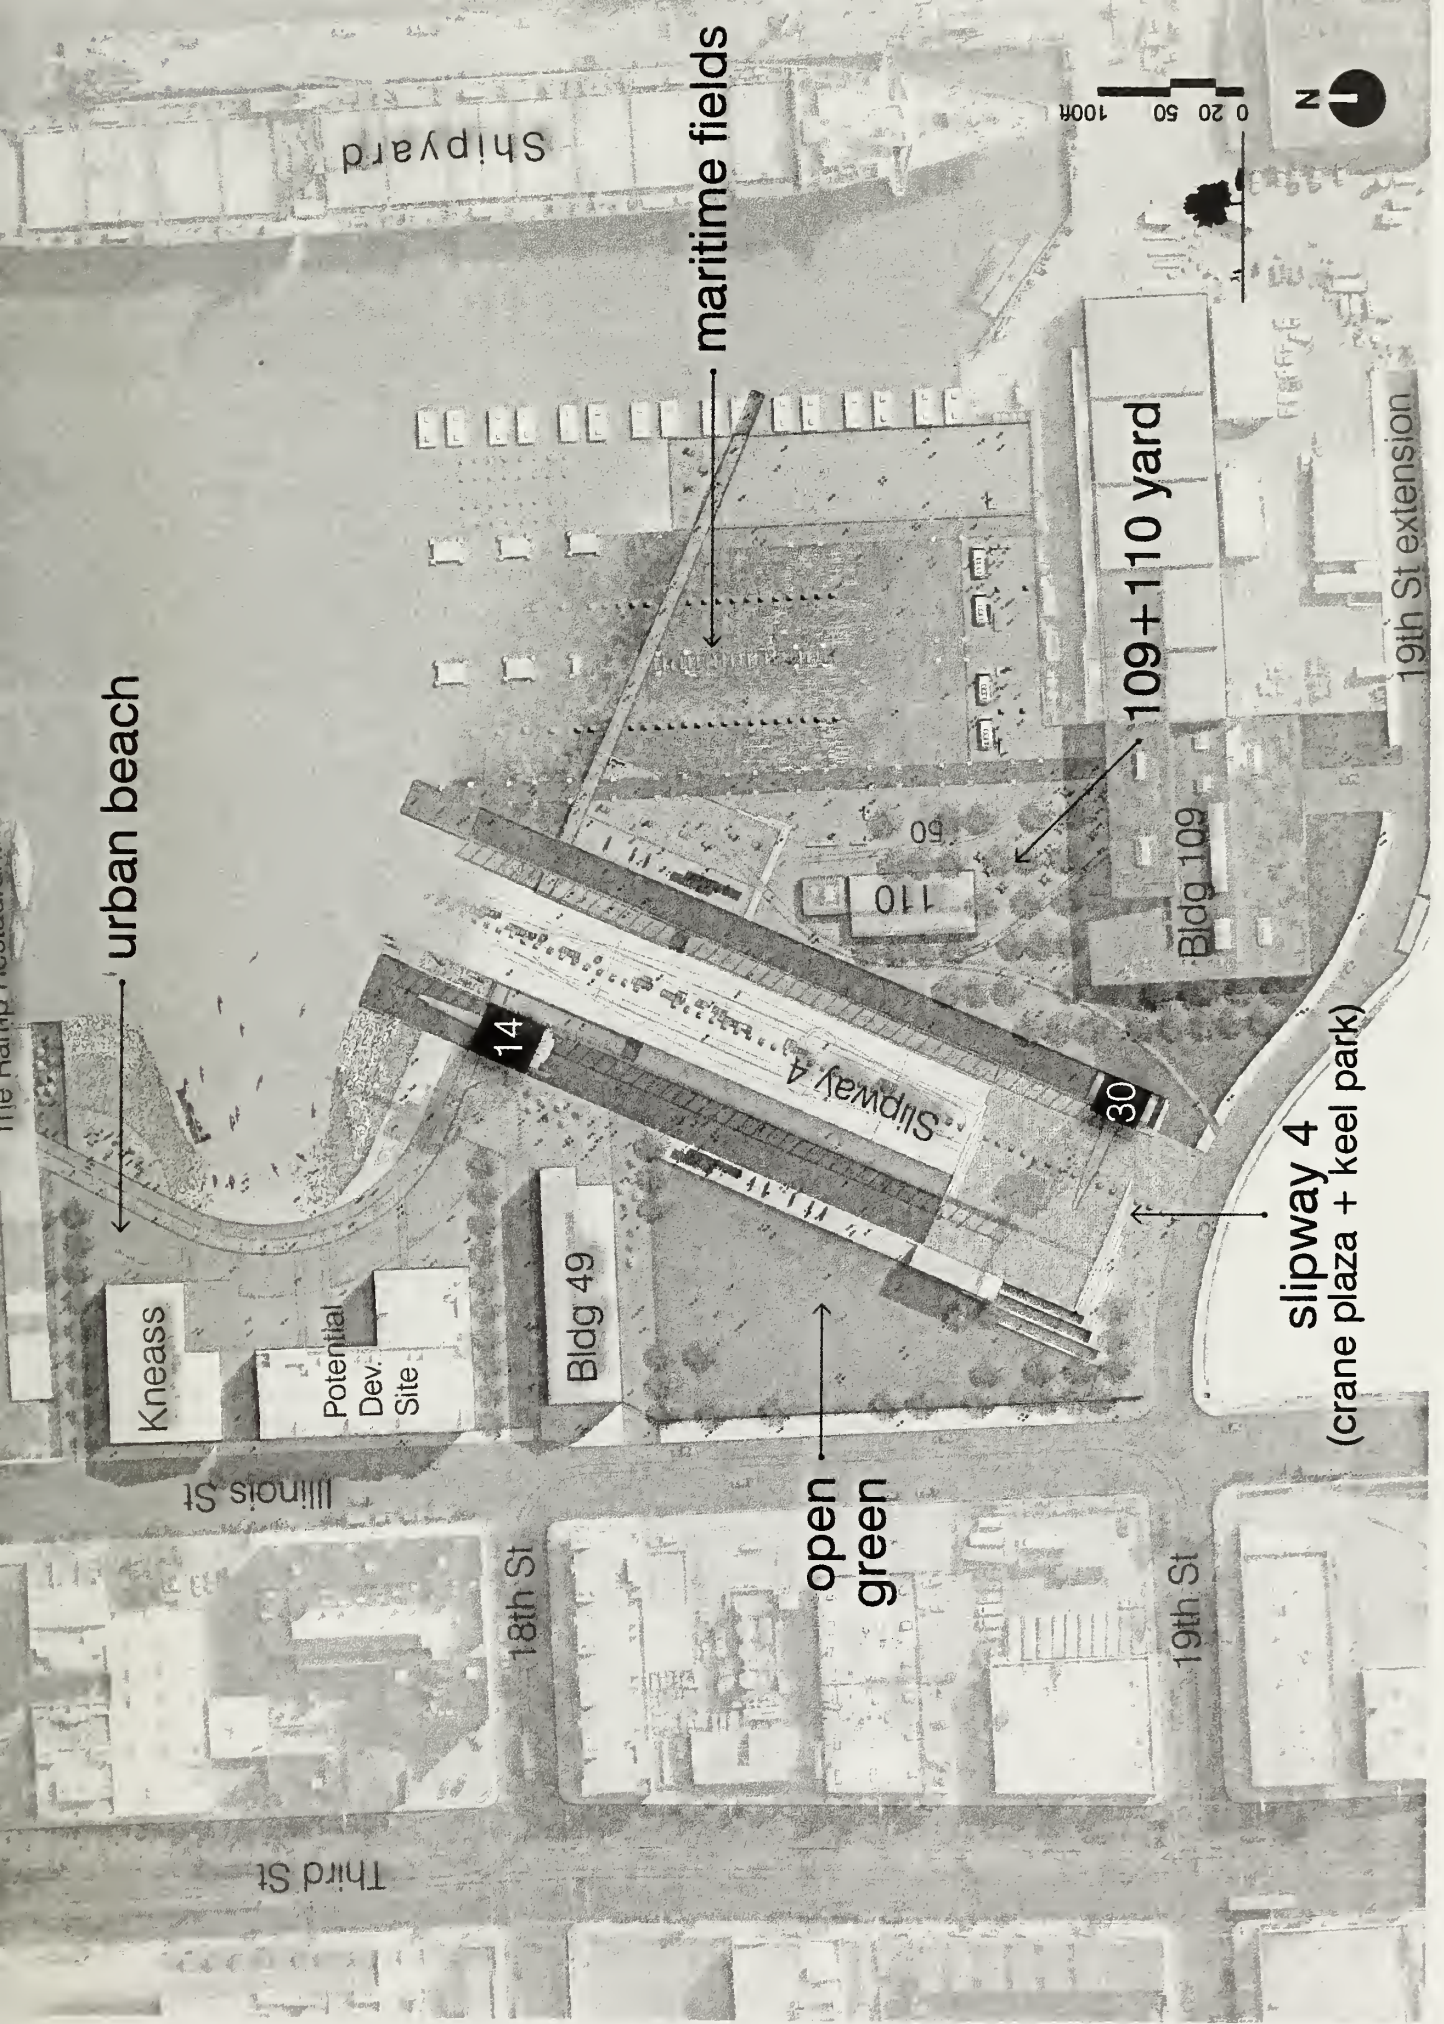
, Crane Cove Park Master Plan- Site Plan
